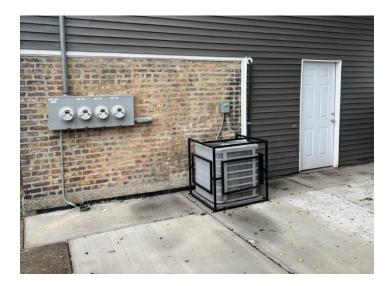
Air Conditioner Compressor on Concrete Slab, Vulnerable to Flood Damage (Typical Installation Method Used in Many Parts of the Chicago Metropolitan Area)
